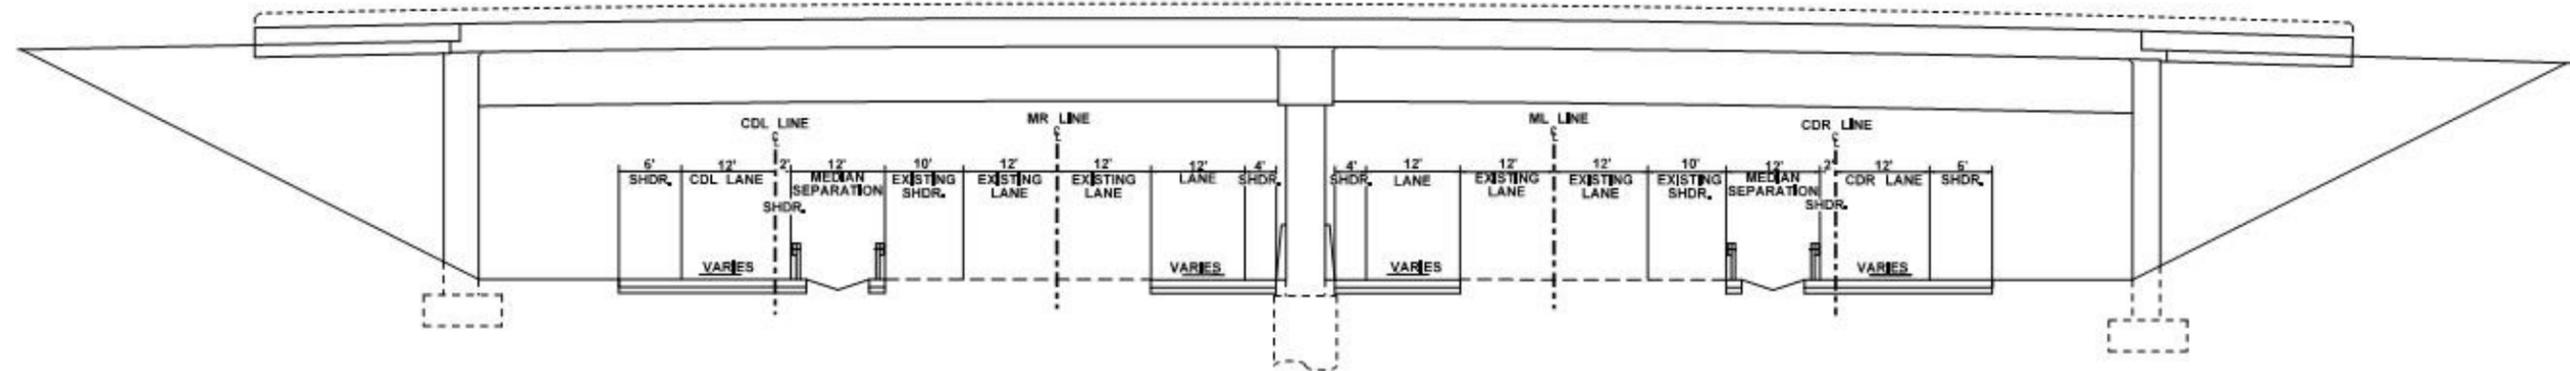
Typical Cross Section at East-West Corridor Structure
